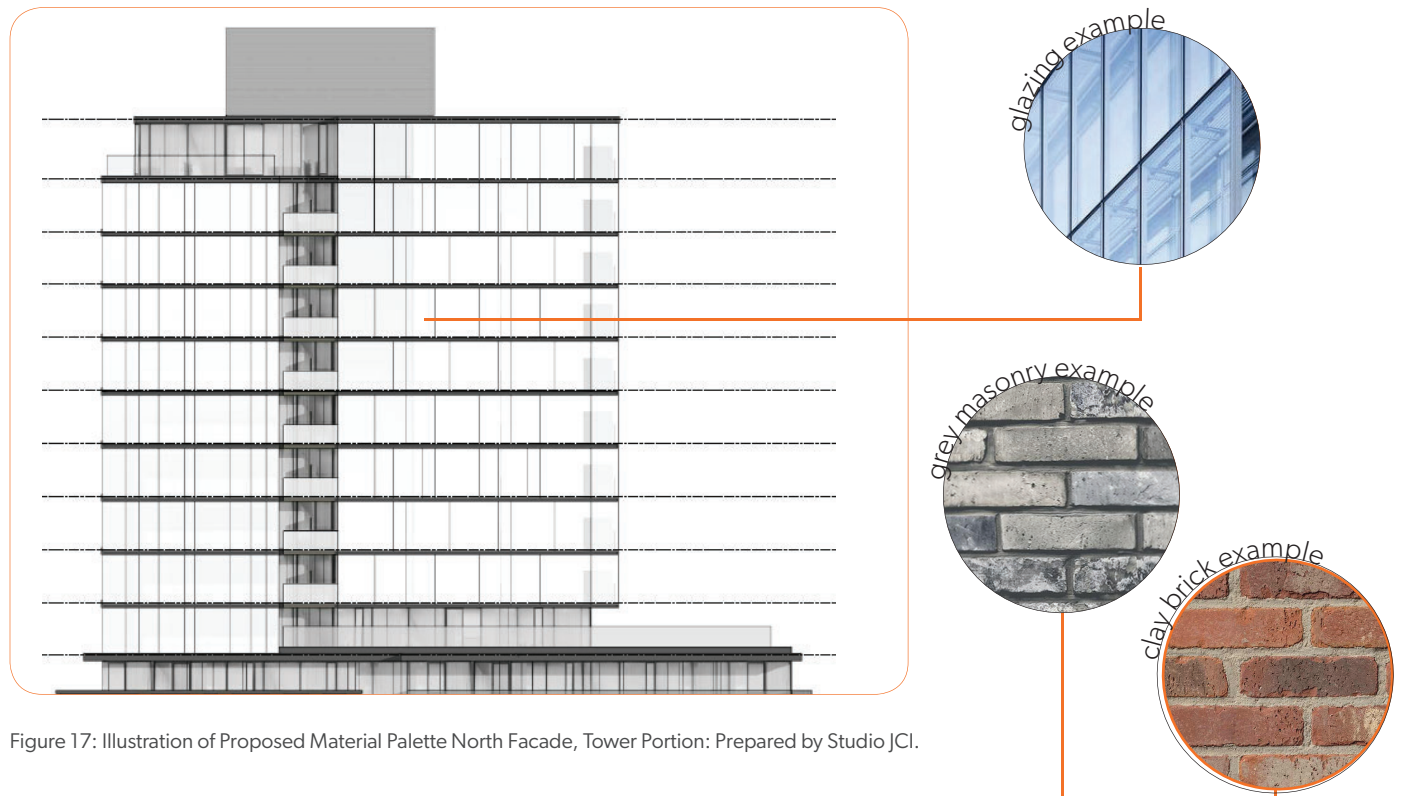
Illustration of Proposed Material Palette North Facade, Tower Portion: Prepared by Studio JCI.
